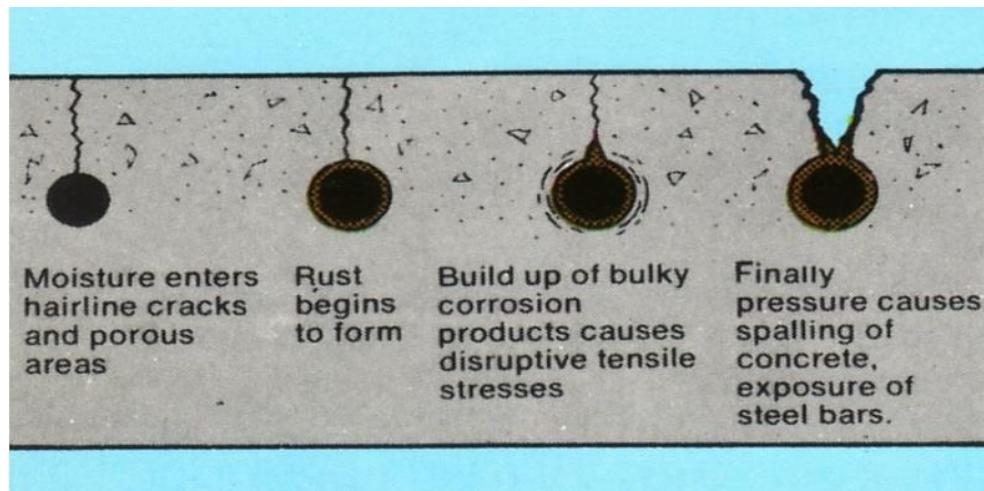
Corroded steel reinforcement possibly due to insufficient concrete cover
